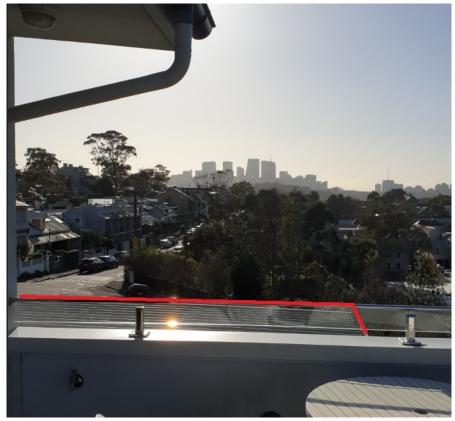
Views from across side boundary and in the centre of second floor rear balcony at No. 113 Short Street
